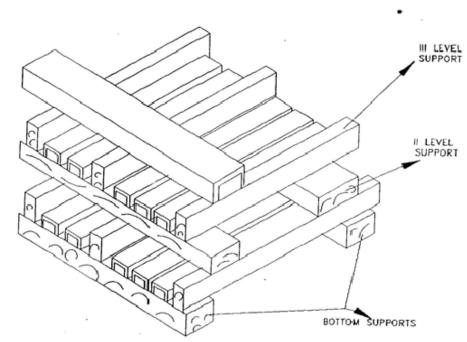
STRUCTURAL STEEL STACKING ARRANGEMENT
